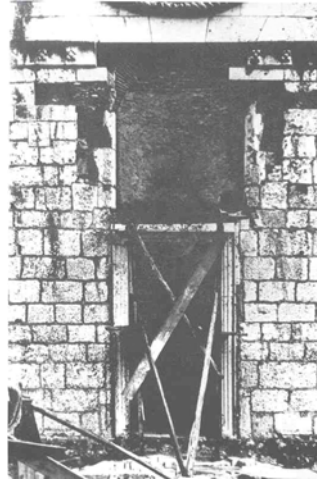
Construction of the door access between elevated choir and narthex (Marques de Carvalho, 1984).
